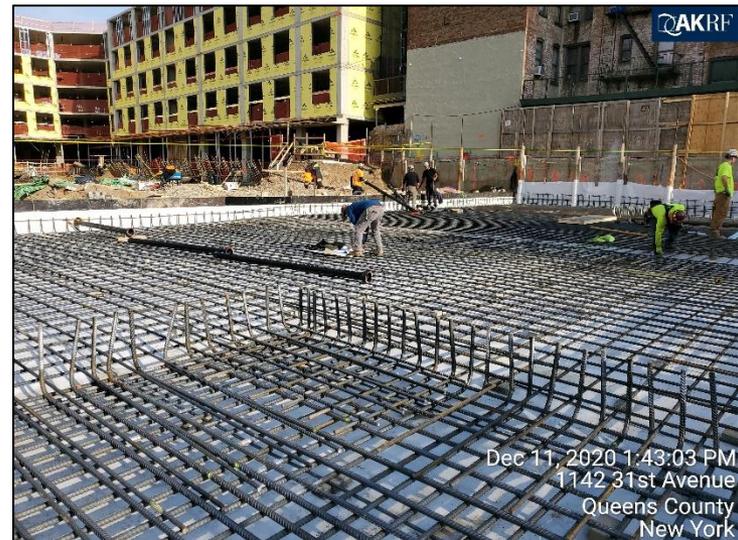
Installed GCP Preprufe 200 vapor barrier/waterproofing membrane below the foundation slab and behind subgrade foundation walls (April 2020).
